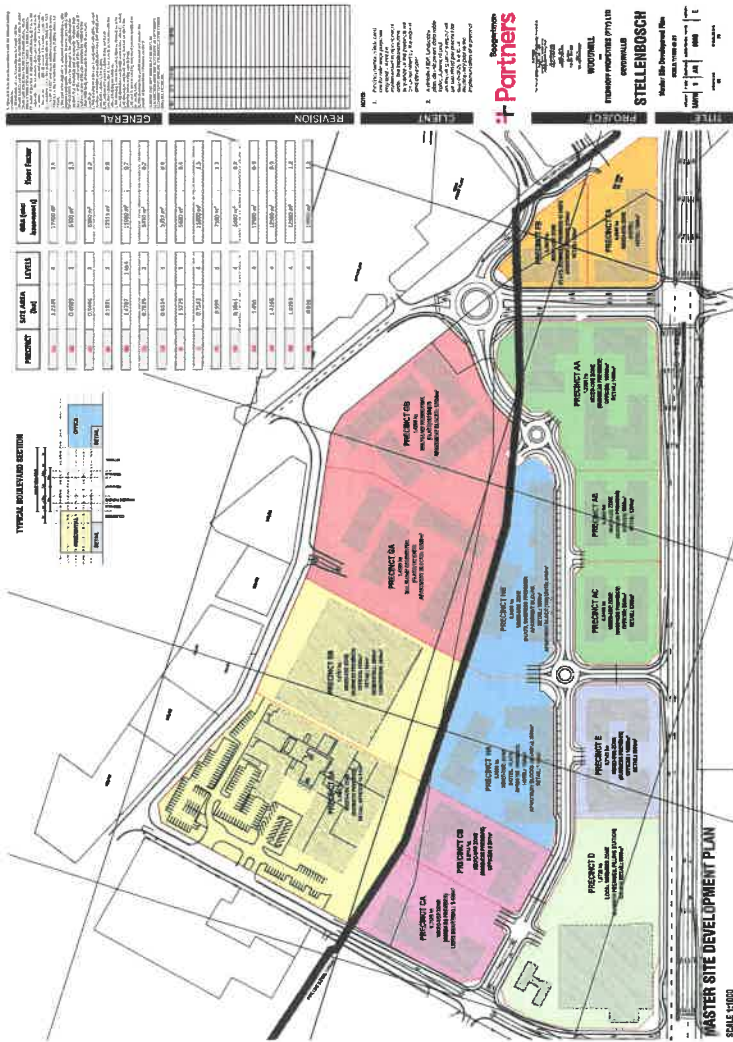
Concept Masterplan for the Northern Extension (Osmond Lange Architects and Planners, 2019)
